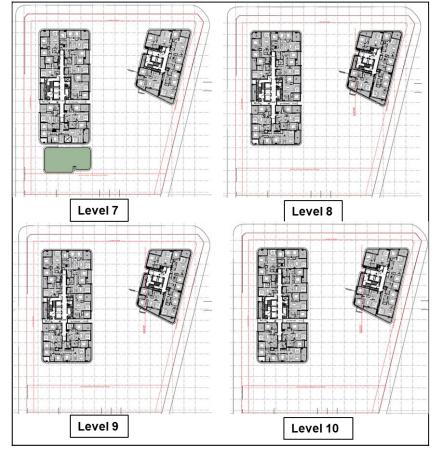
| Proposed Floor Plans (Source: Applicant's Architectural Plans, Rev F dated 27/05/2024)
